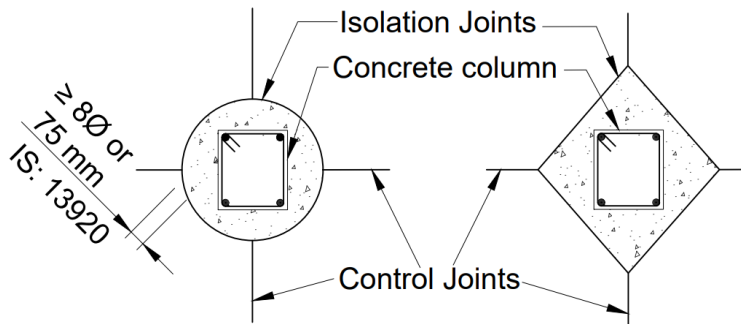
Schematic diagram of an isolation open joint around concrete columns (IS 13920)
